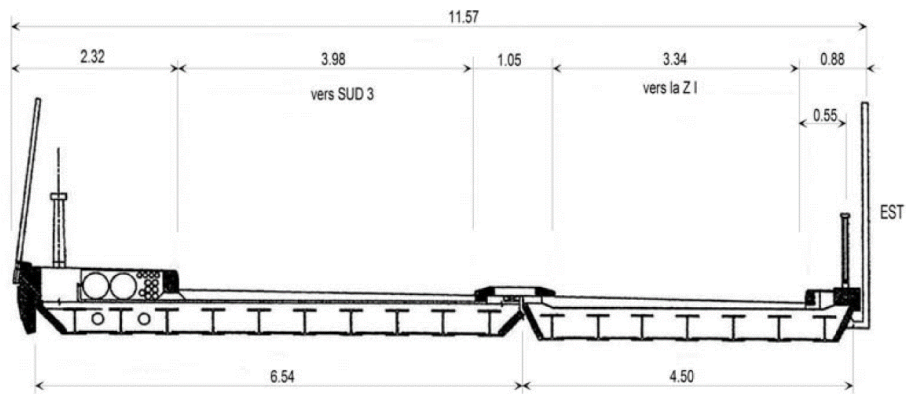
Deck cross section of the existing bridge (Matteis et al., 2008)
